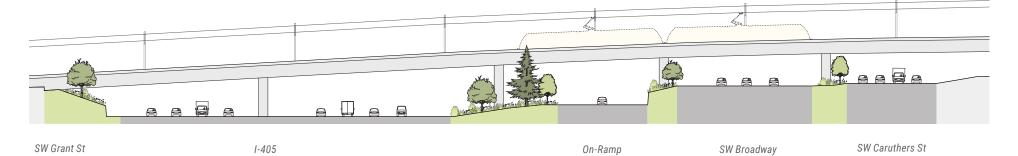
DRAFT Downtown Tie-in cross section
